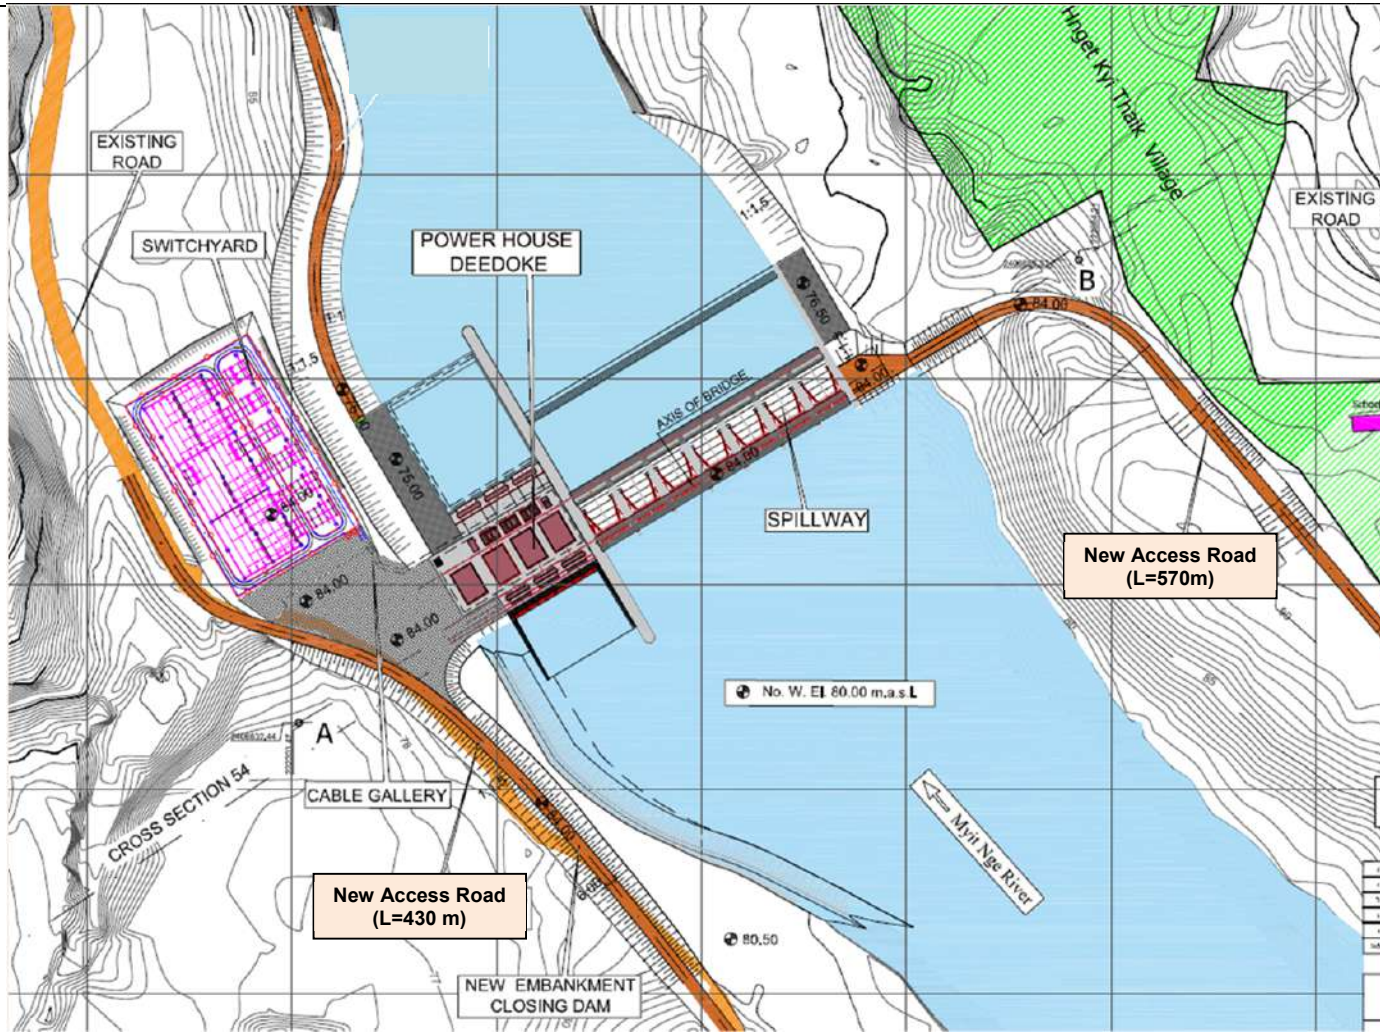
The Layout of Project Facilities at the Selected Dam Site
